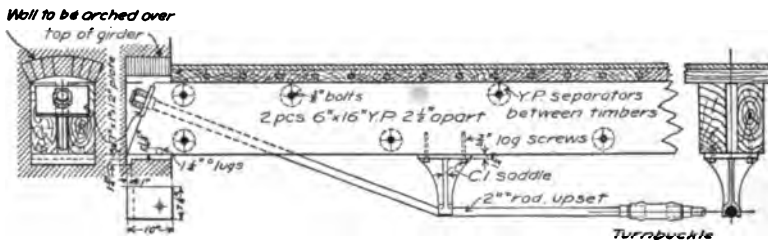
e*. Details of Trussed Floor Beams for Warehouse.
